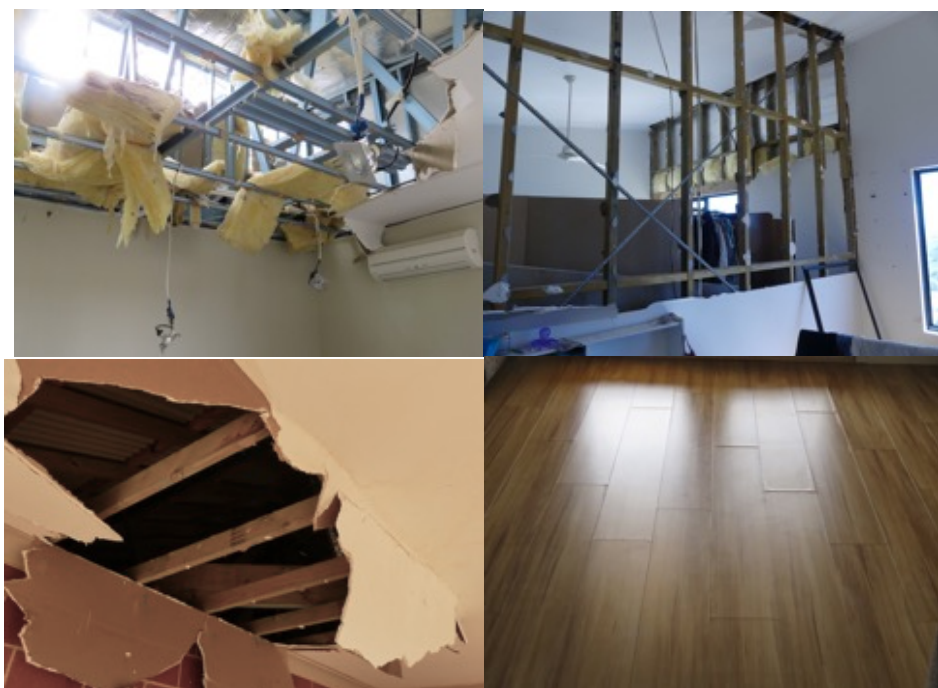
Damage to plasterboard wall and ceiling linings and timber floor
